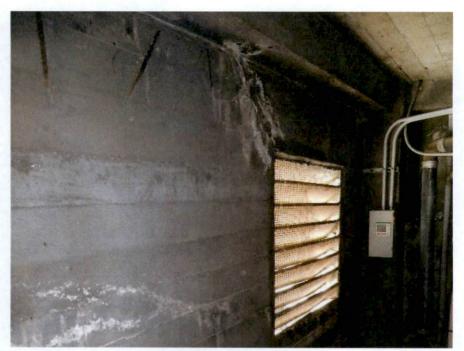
Cracking and efflorescence at opening in concrete for mechanical vent – Tenth Floor.
